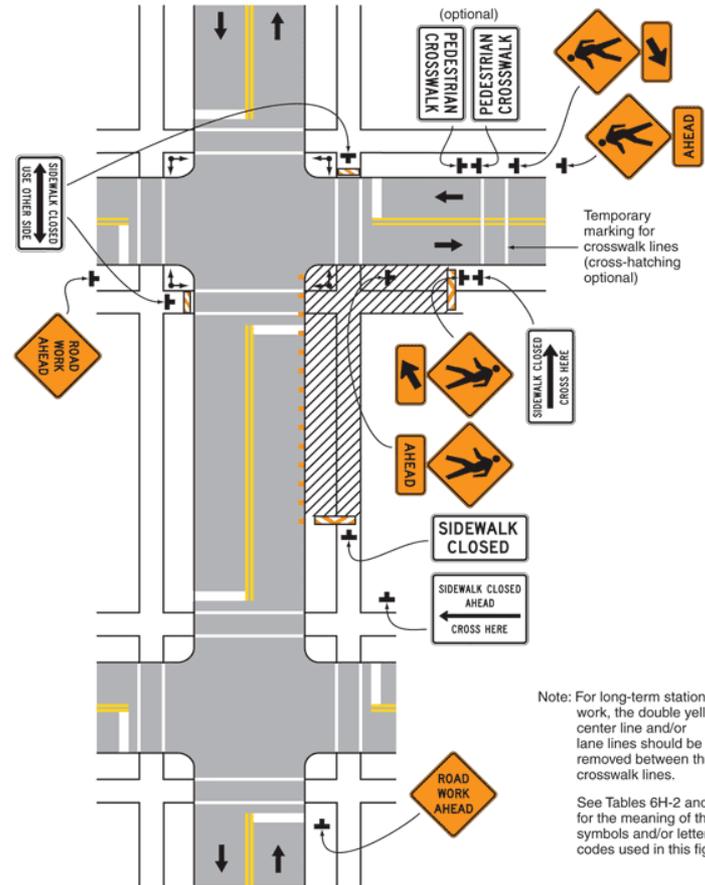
H-28. Sidewalk Detour or Diversion (TA-28)
